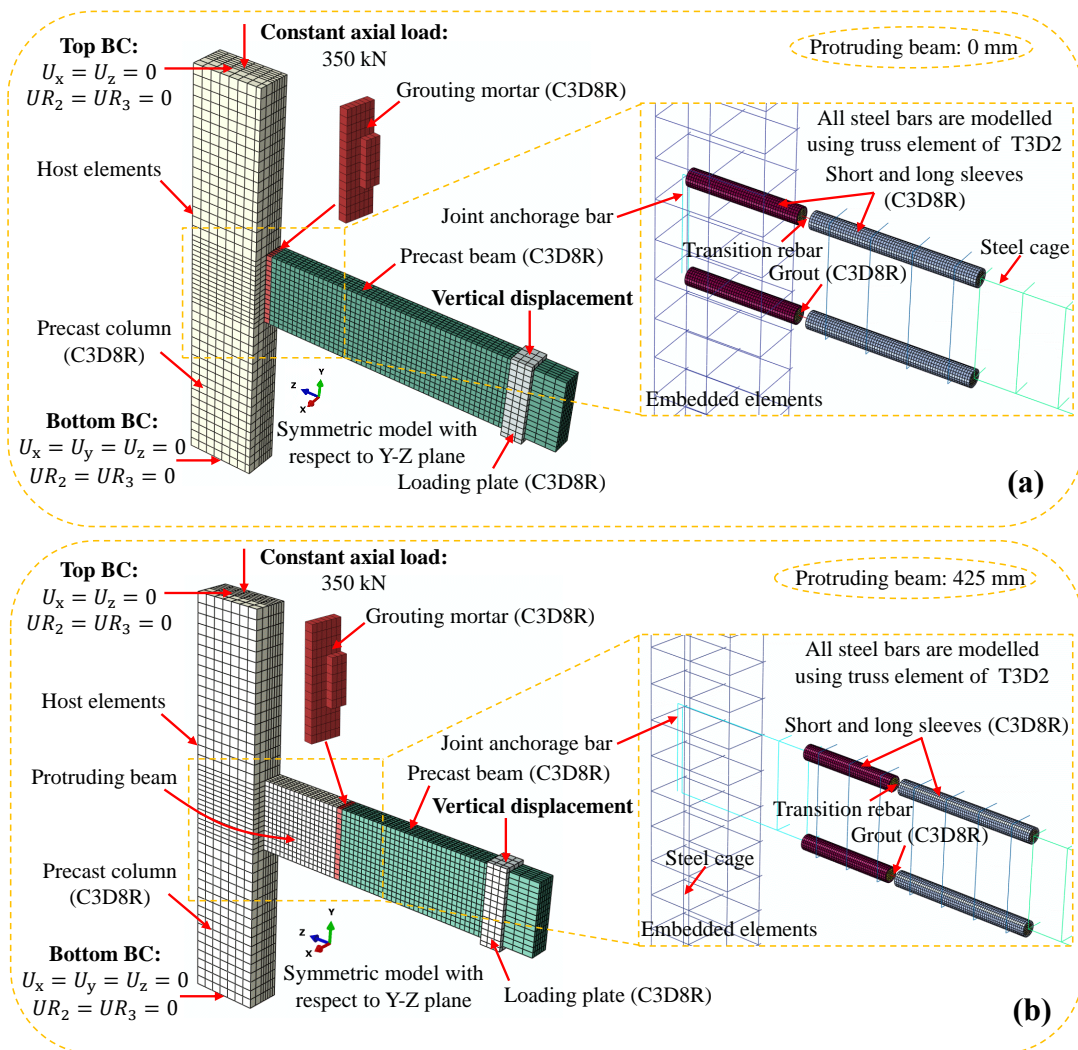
Finite element models for the prefabricated beam-column joint linked using double-grouted sleeve connectors: (a) with no protruding beam (BCJ-1 to BCJ-3); (b) with a protruding beam of
